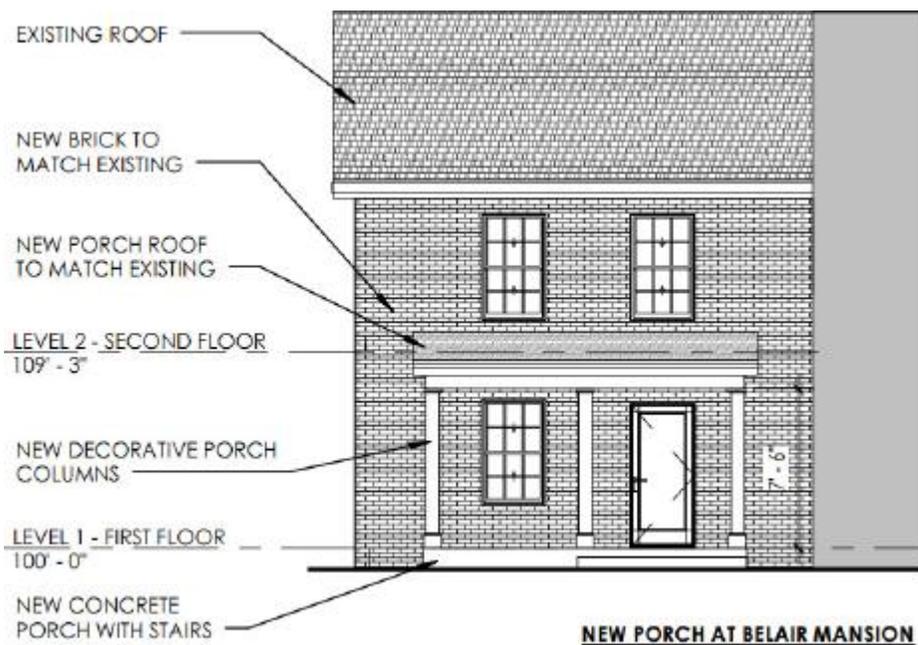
Rear/left porch proposed to be added to the c.1828 portion of the building.
